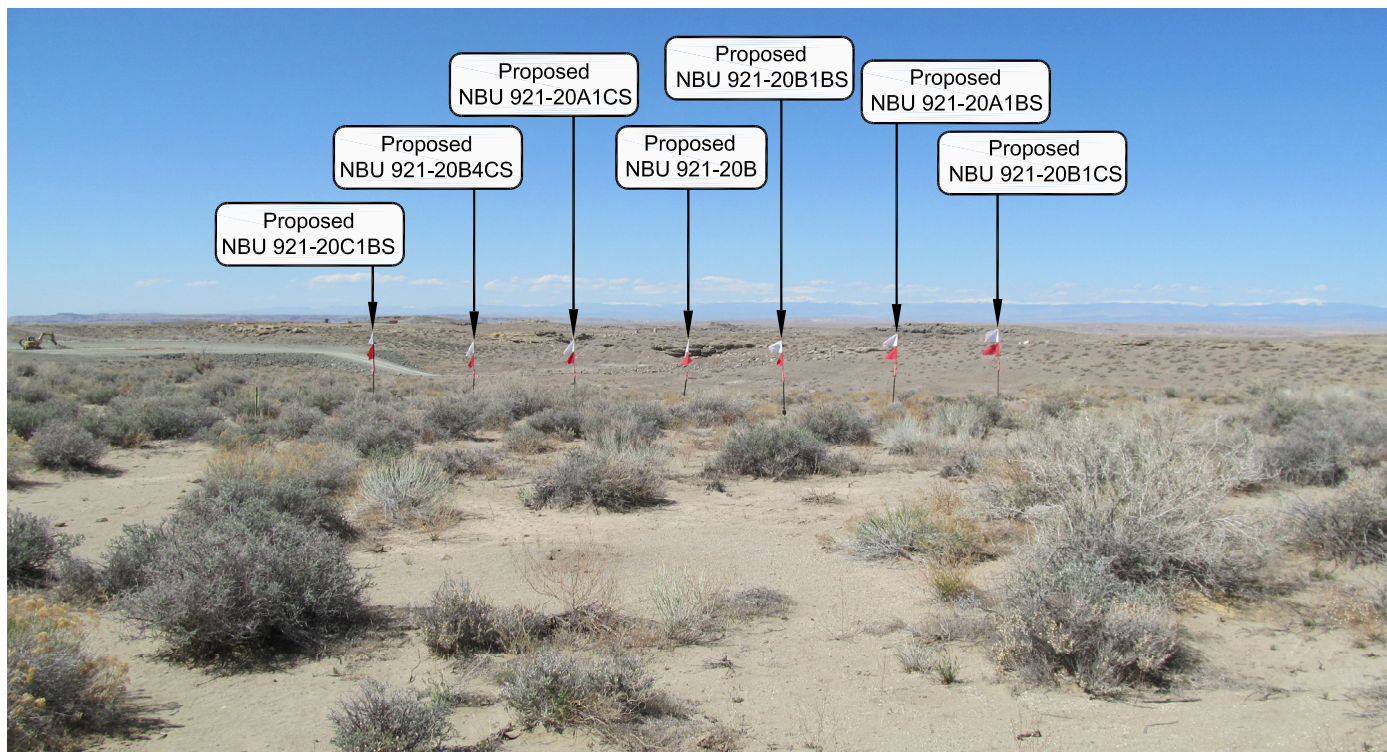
PHOTO VIEW: FROM CORNER #5 TO LOCATION STAKE
